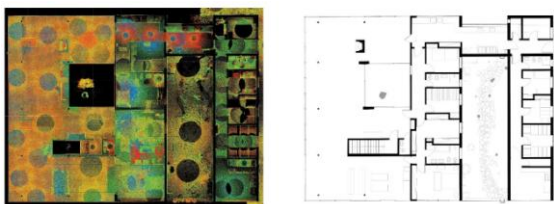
First floor plan of the *Casa de Vidro*, point cloud extraction and drawing. Author's elaboration, 2018.
